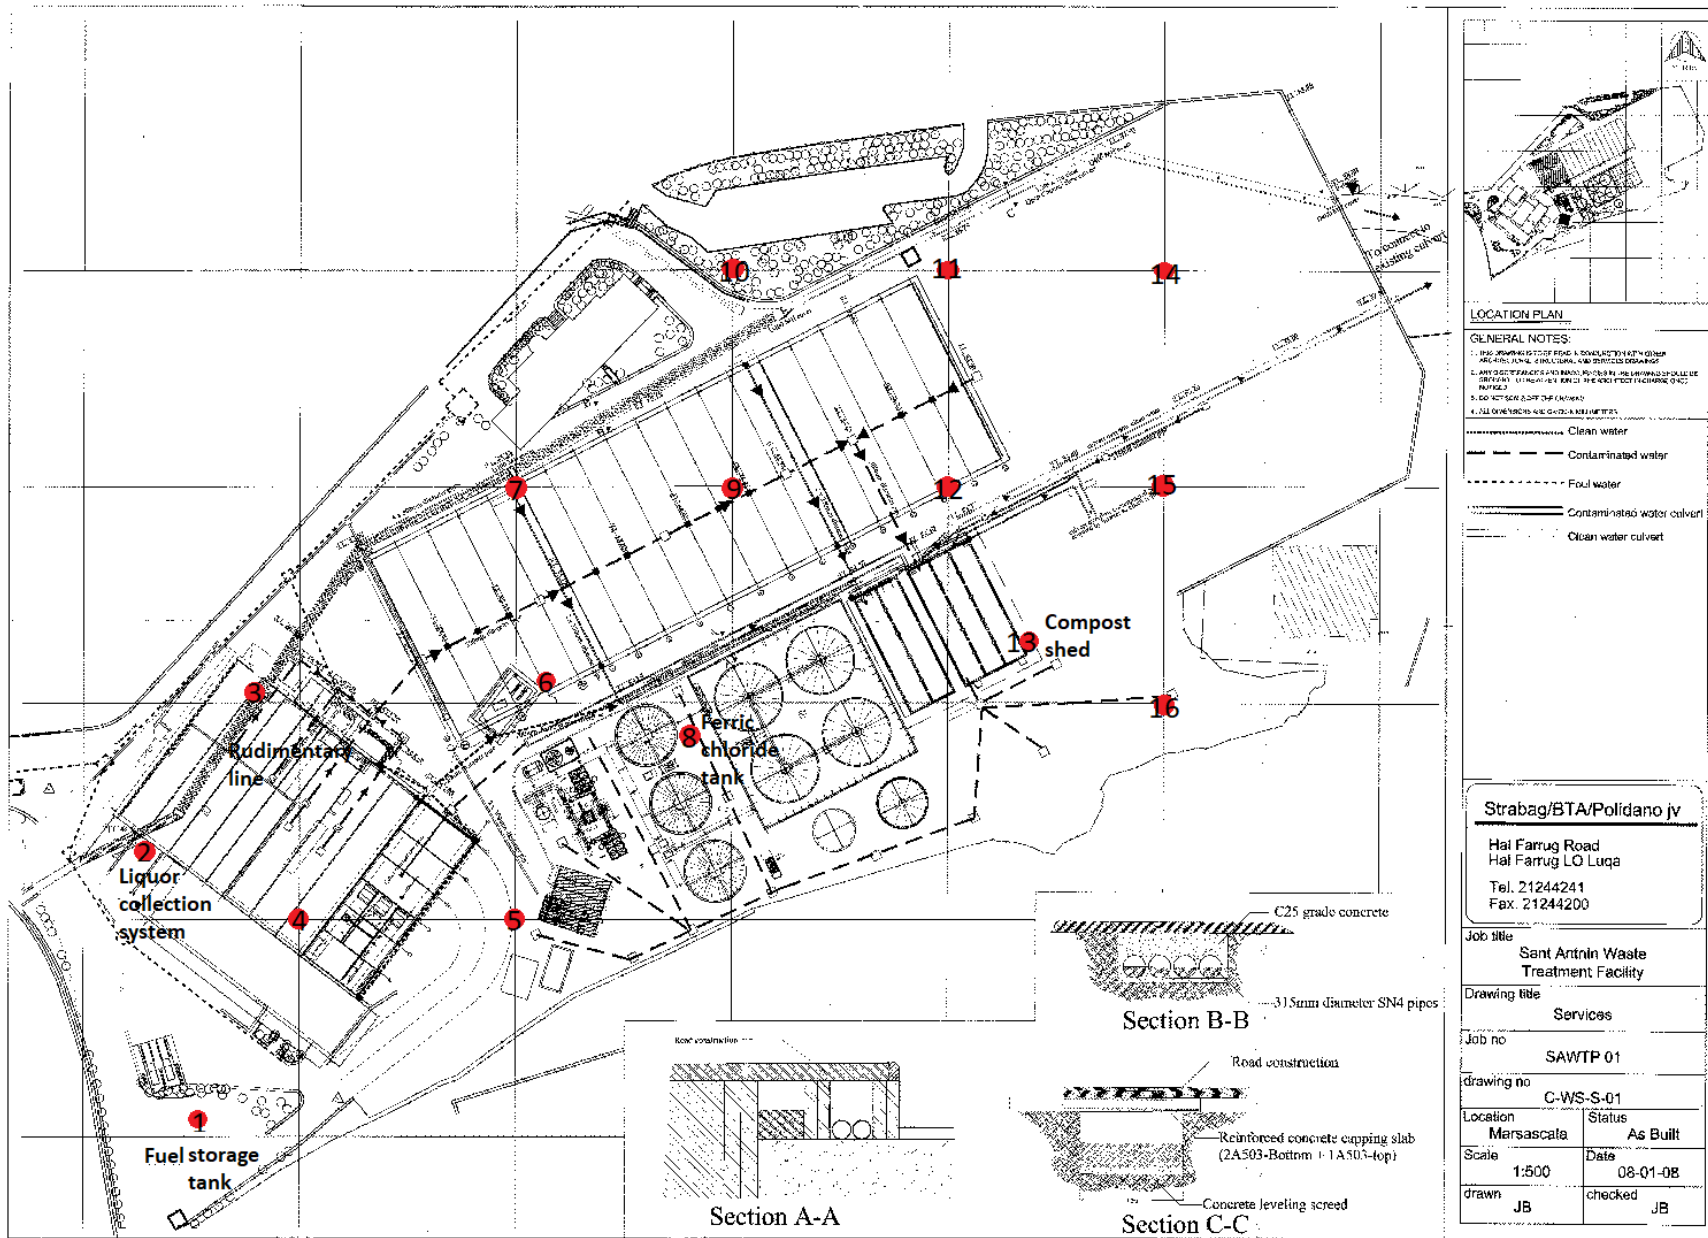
Site plan denoting proposed land sampling locations as red dots. Each point has been given a number.
